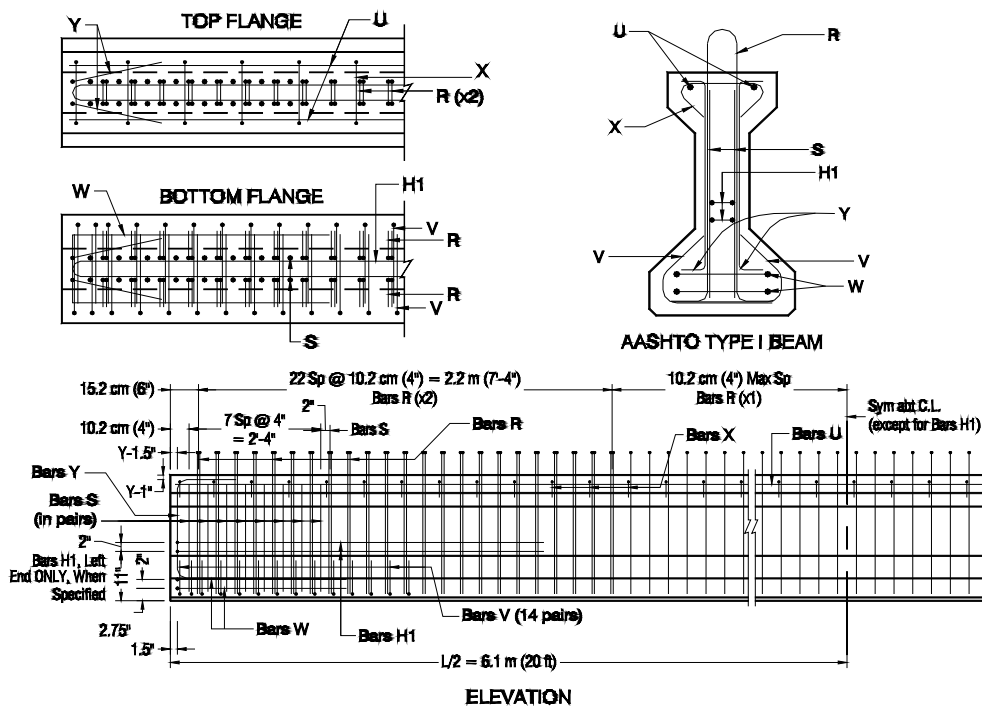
Mild Shear Reinforcement Details of Test Specimens
